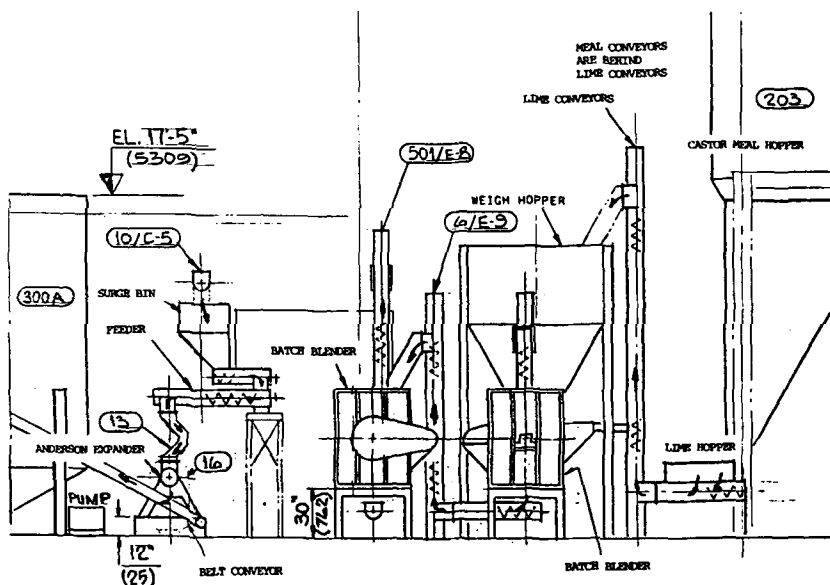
Elevation view showing batch method for dry mixing of lime and the equipment selected.
